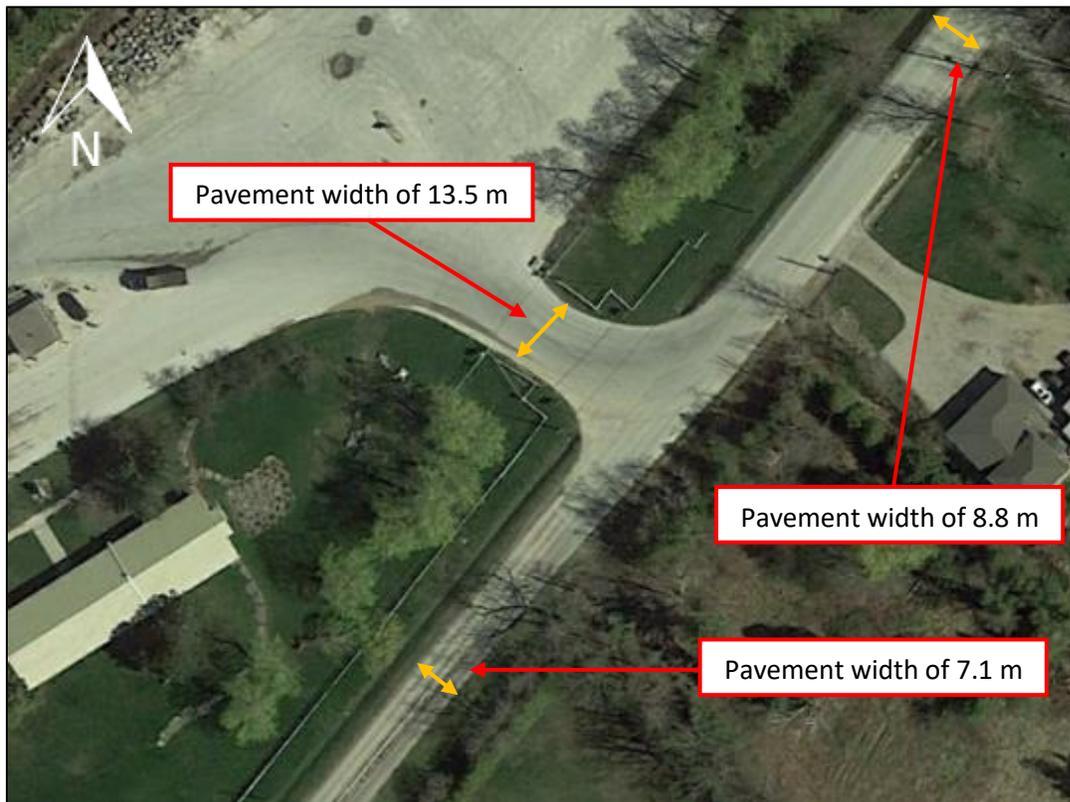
Pavement widths around the existing truck entrance (© Google, 2018)
